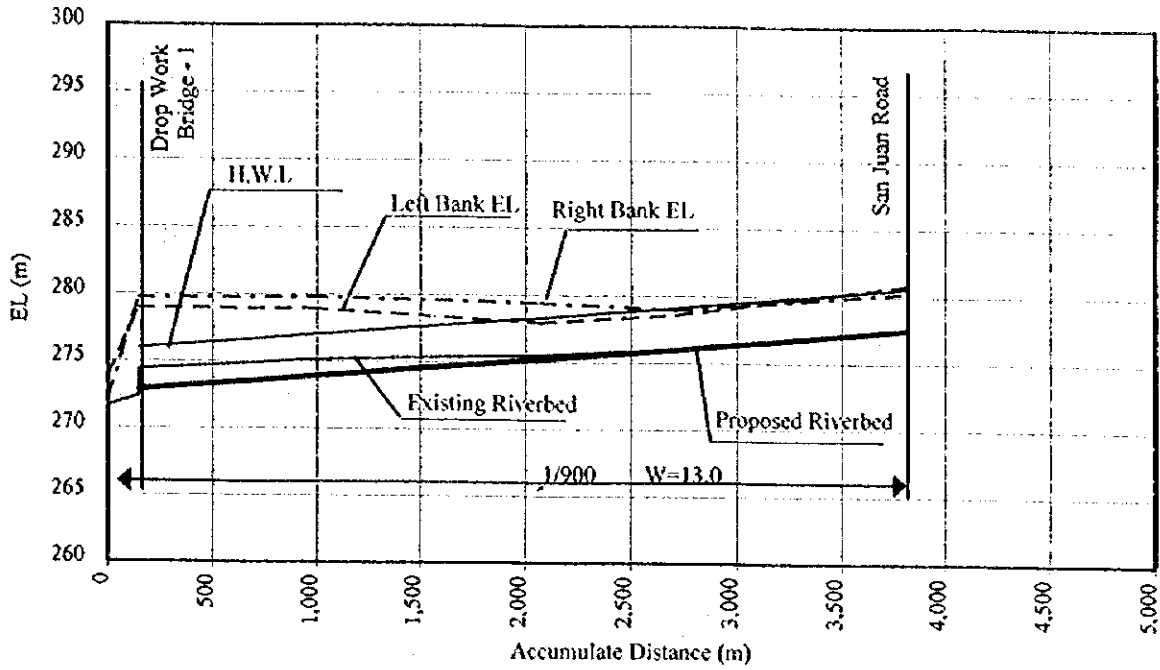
(2) LONGITUDINAL PROFILE OF DRAINAGE IMPROVEMENT
